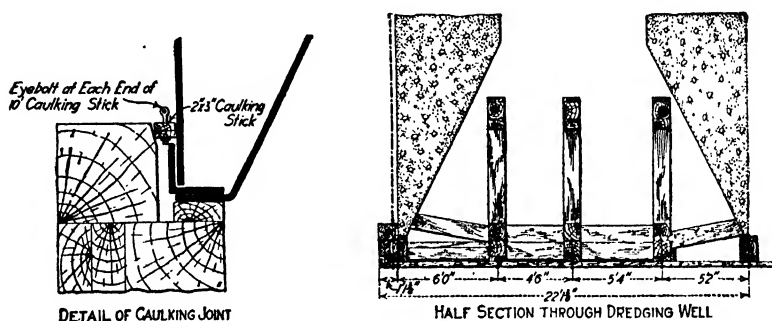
False Bottom of New London Bridge Caisson.
